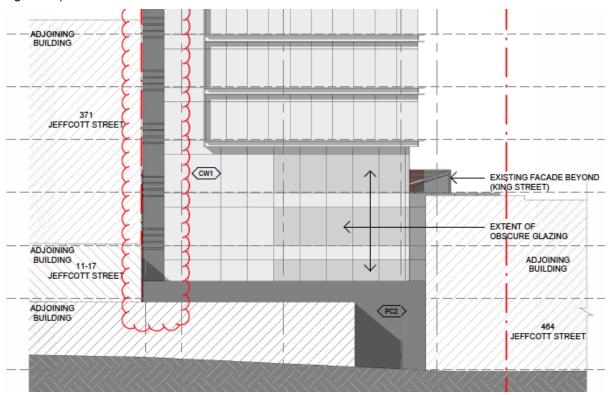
Proposed West Elevation showing extent of obscure glazing. From Drawing S302
